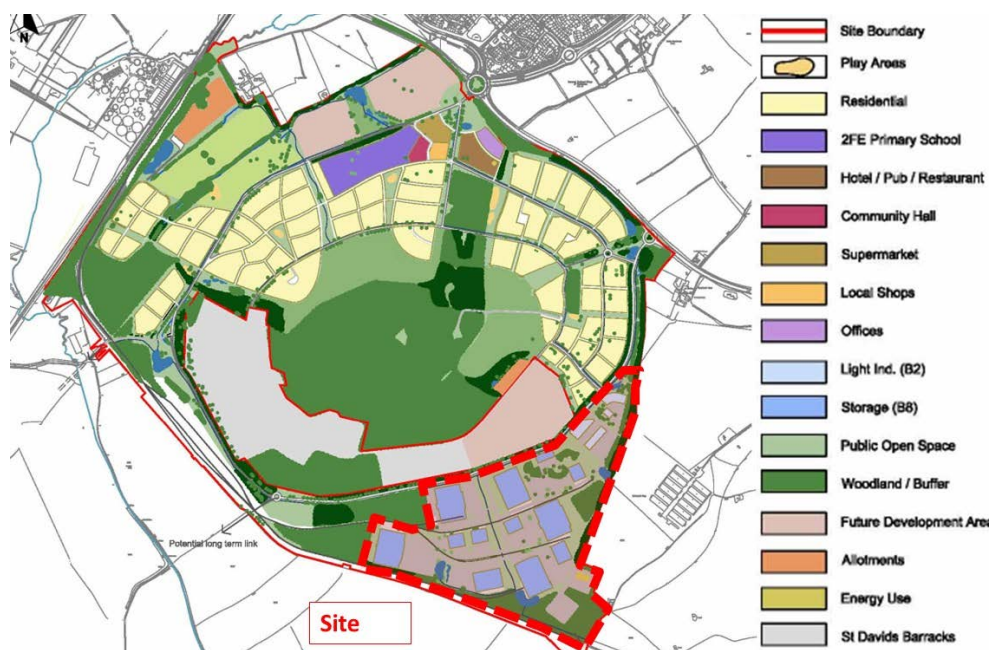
Site Context Within Outline Application Strategic Masterplan
